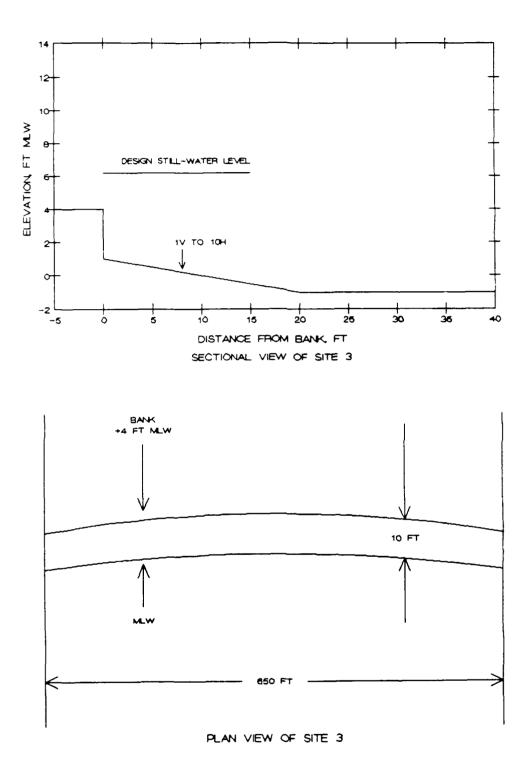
SECTIONAL AND PLAN VIEWS OF SITE 3
